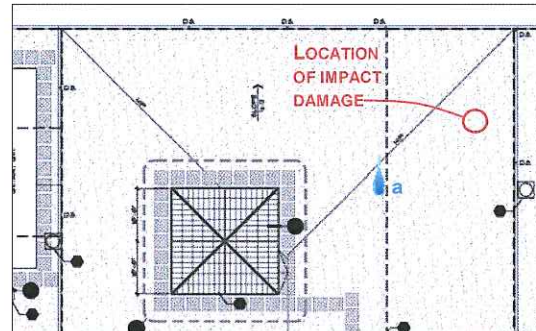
Partial Roof Plan at Leak Location (a).
